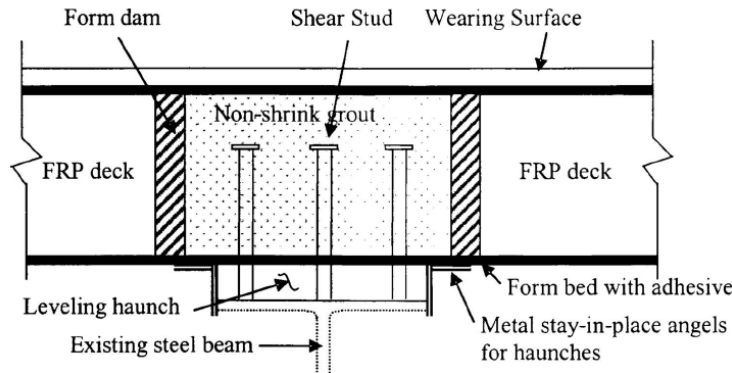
Deck to girder connection by shear studs (Hong & Hastak, 2006)
